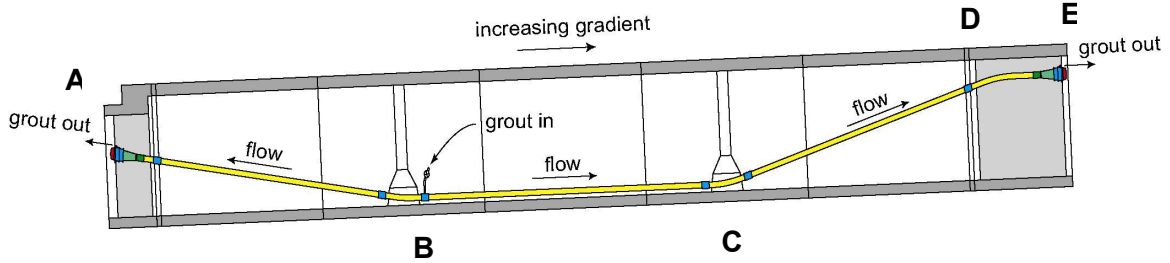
Grouting procedure for end spans of Span-By-Span Bridges
